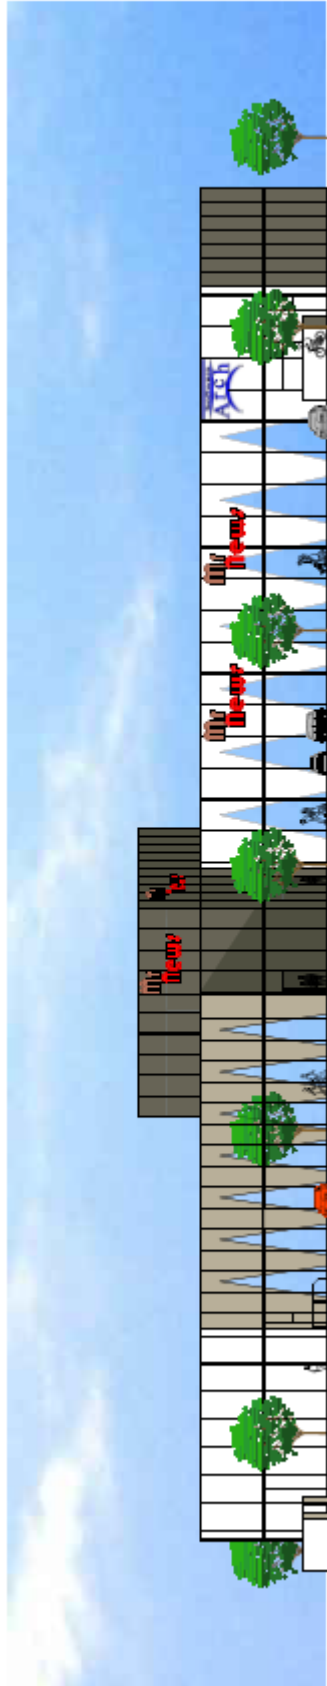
Revised (Current) Minden Lane Elevation (North Eastern) (8.6.2015)
